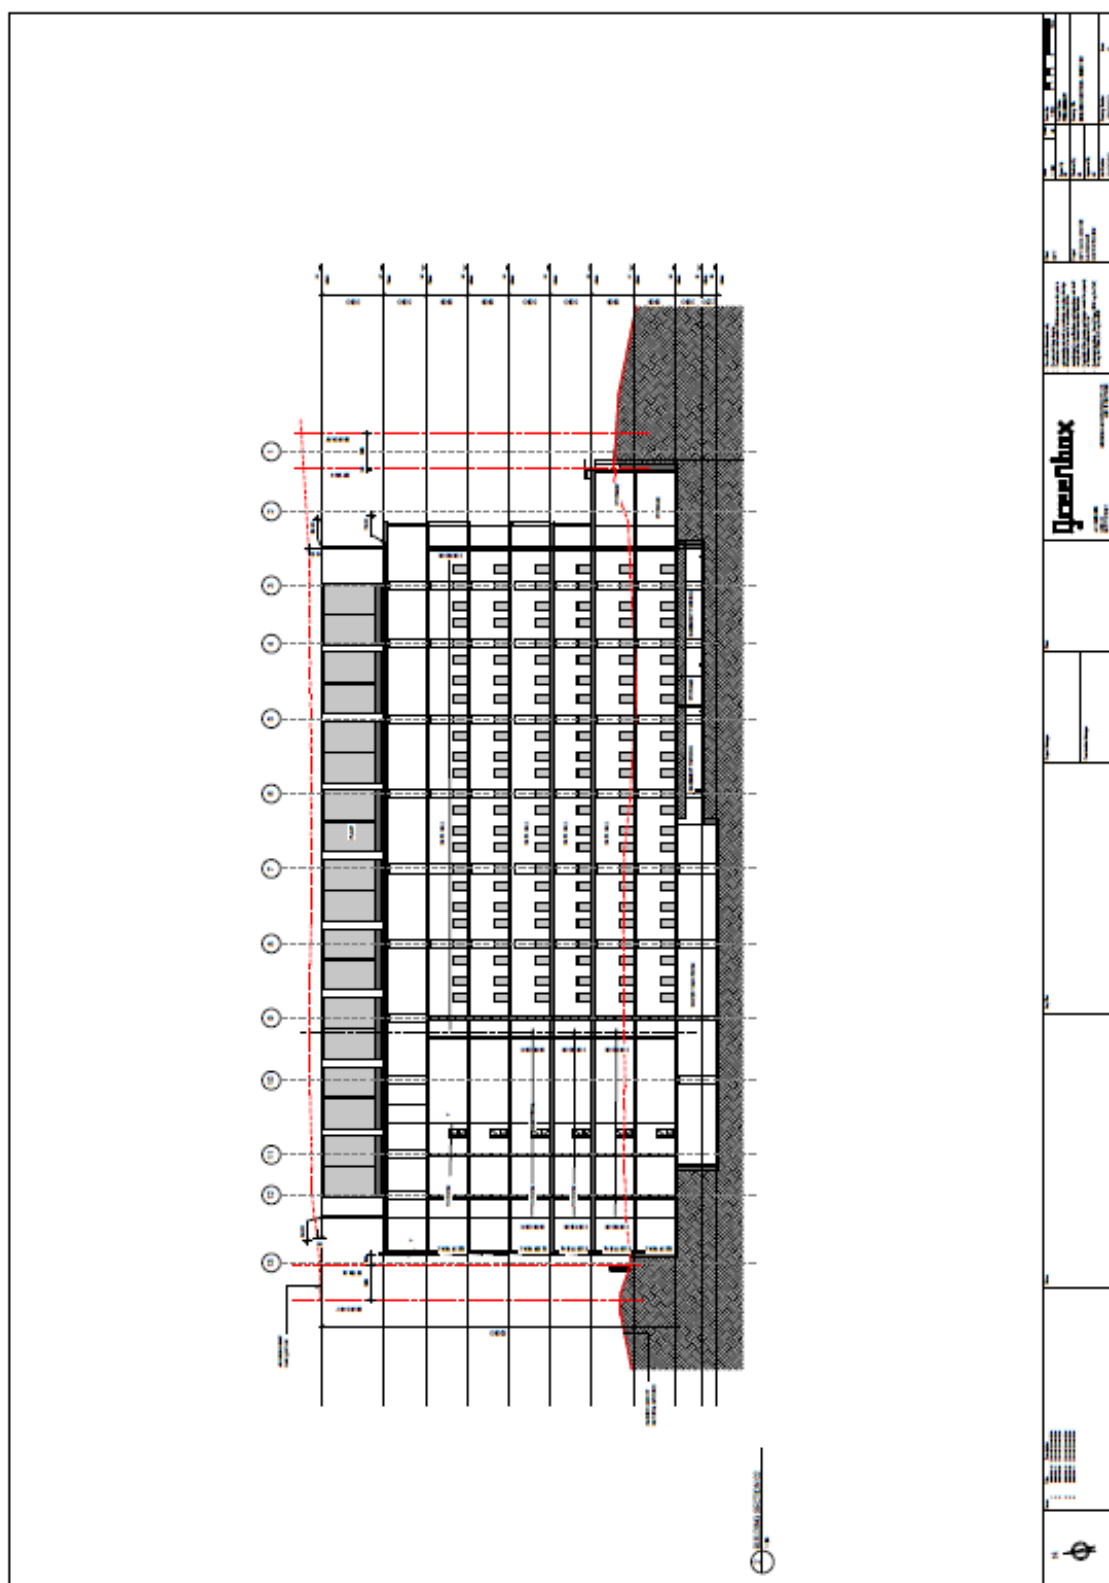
Northeast-southwest section of the proposed works. (Source: Greenbox Architecture, 2025)
